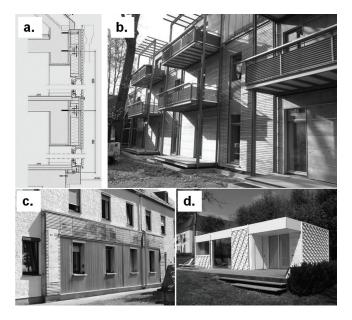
(a) Vertical cut through prefabricated wooden element for façade retrofit (Huber&Sohn); (b) completed façade retrofit; (c) pore ventilation test façade at a multifamily building; (d) solar Decathlon Home at the B&O Park grounds (image used courtesy of RK-Stuttgart Architecture and Energy Design).
